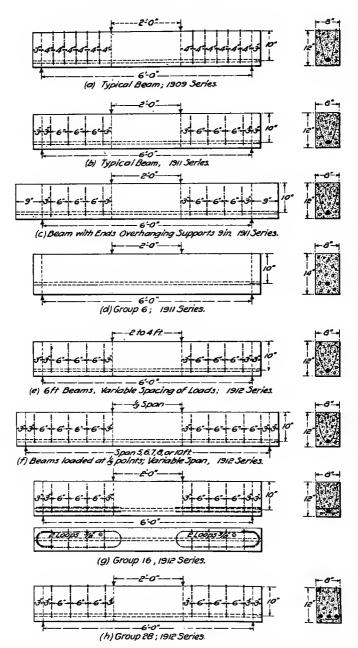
TYPICAL FORMS OF REINFORCED CONCRETE BEAMS USED IN THE TESTS.
